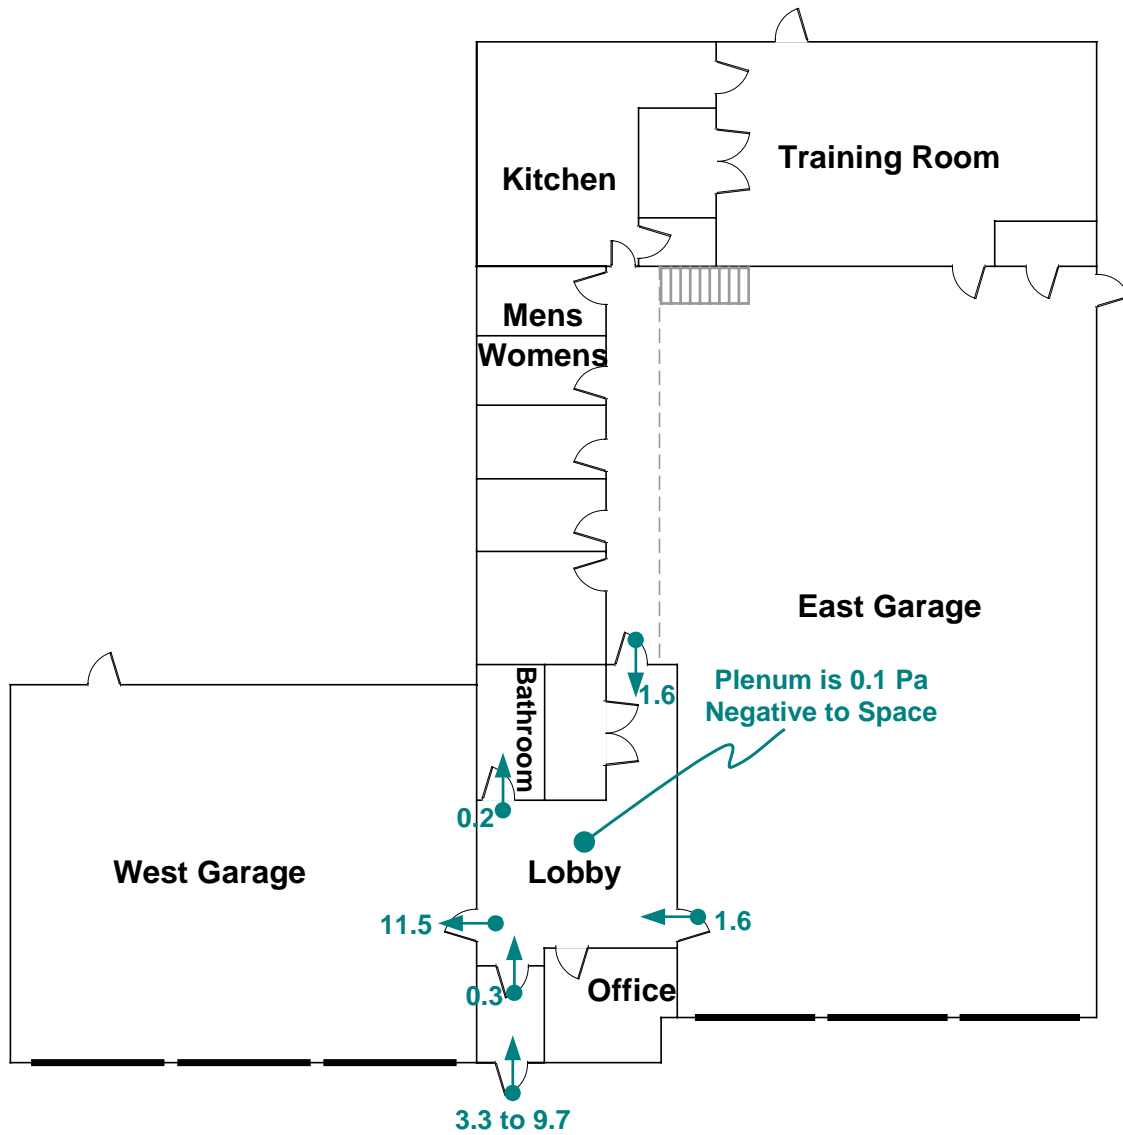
First Floor Pressure Differences between Rooms with West Garage Exhaust On (EF-1)
